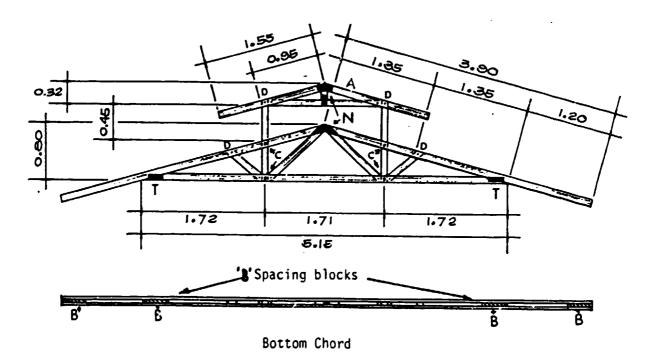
"W" truss the ventilation jack roof, used for the saw doctoring workshop
